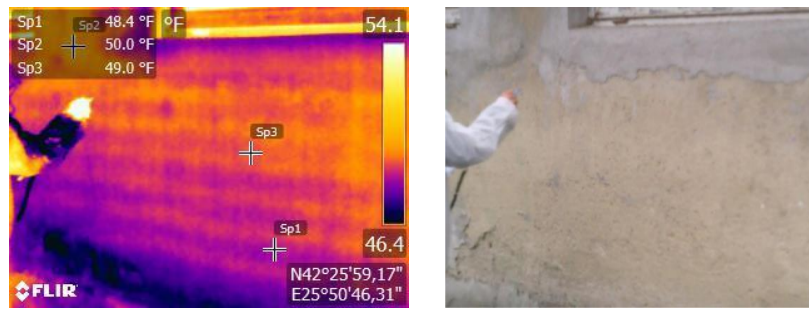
Thermal and visible image at window 6 of the building wall – envelope
